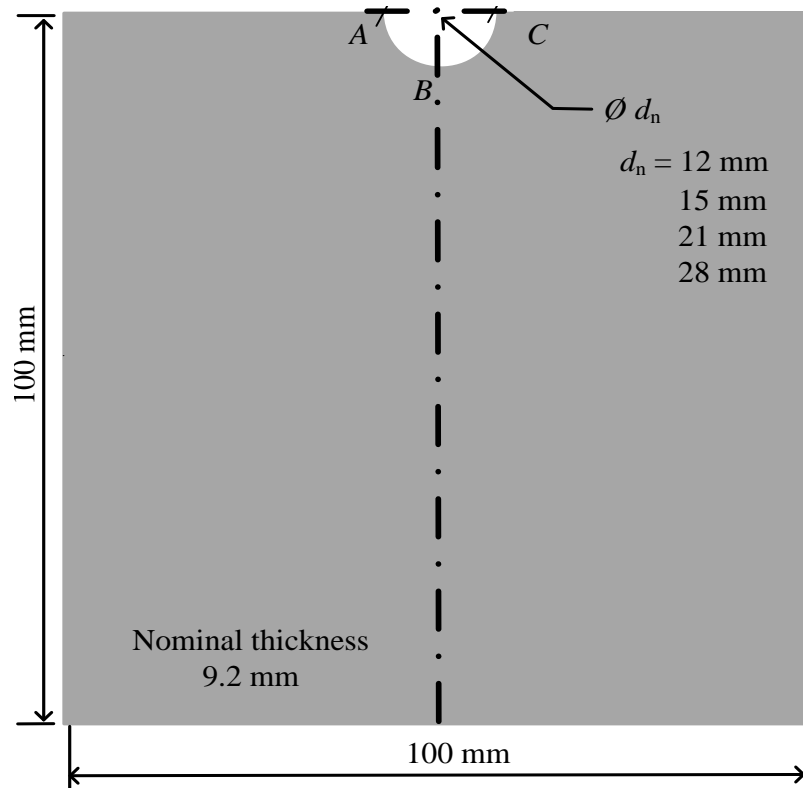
Plan of pin-bearing specimen size constant at 100×100 mm (Scale 1:1).
